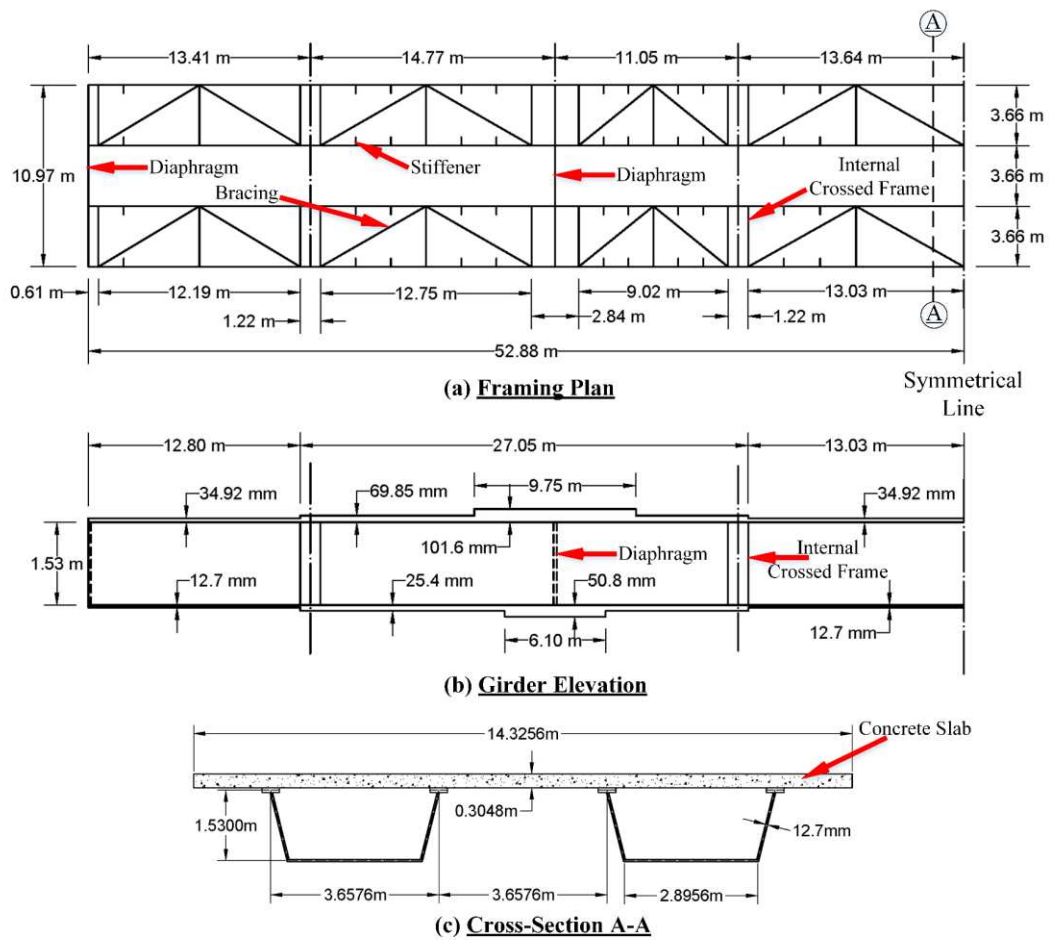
Details of the modeled bridge (a) plan view, (b) girder elevation, and (c) cross sectional view
